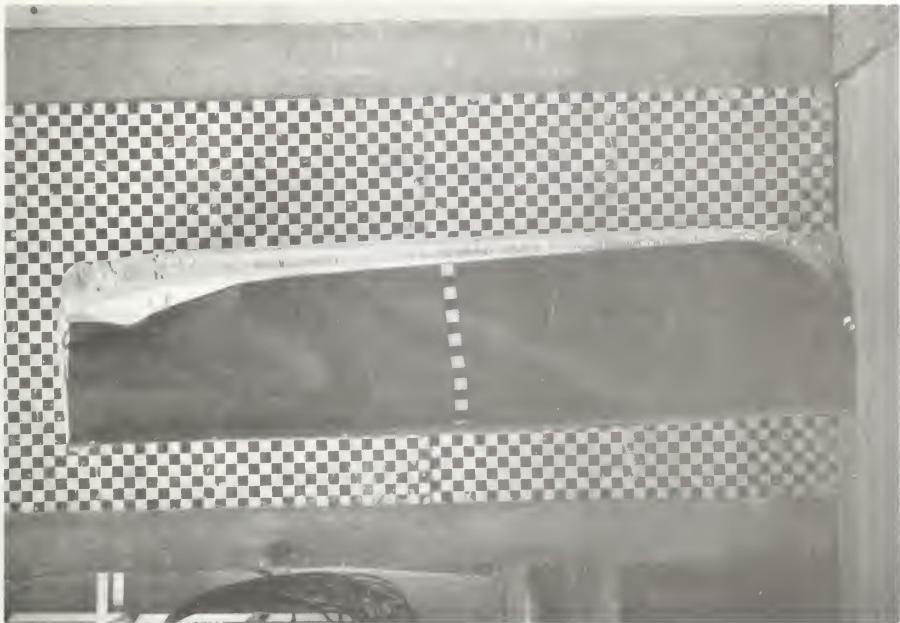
POST-TEST BARRIER FACE - VIEW 2
